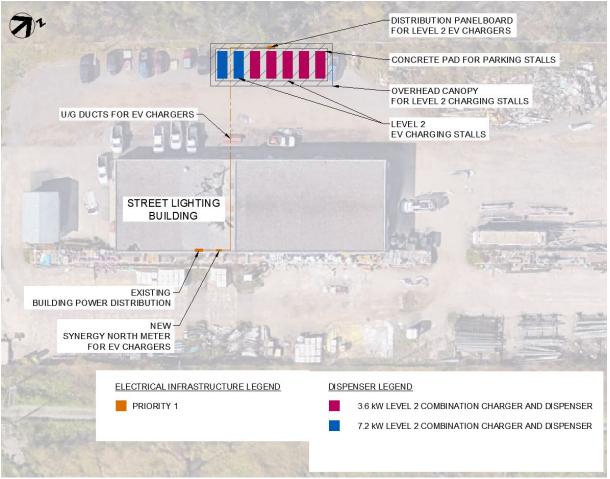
Traffic Control and Street Lighting Conceptual Site Plan
